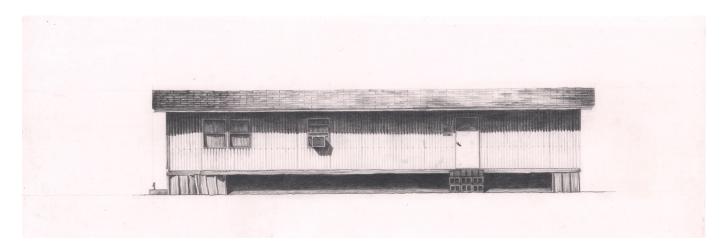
East elevation of Mrs. Zee's Trailer. Hand drafted, pencil on arches. Student work by Will Hall.
